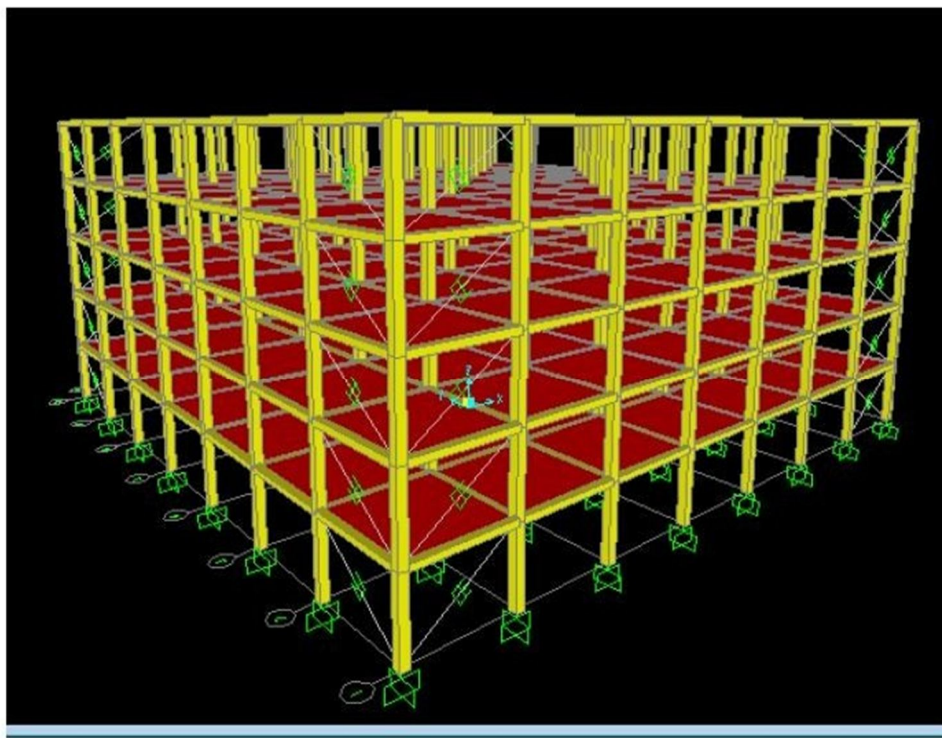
SAP2000 model of the G+4RC frame with VE dampers installed (diagonal link elements visible at exterior bays on all four faces of the structure).
